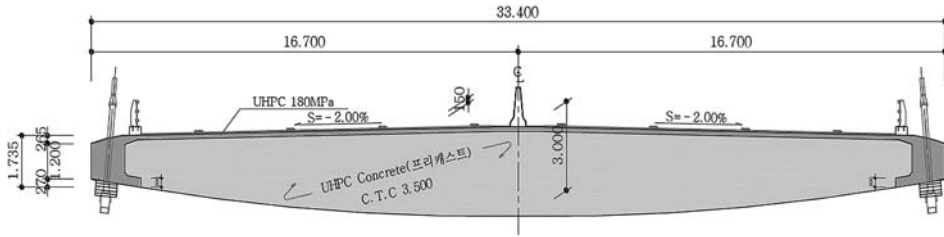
Section through bridge deck showing parabolic cross-beams [151]
